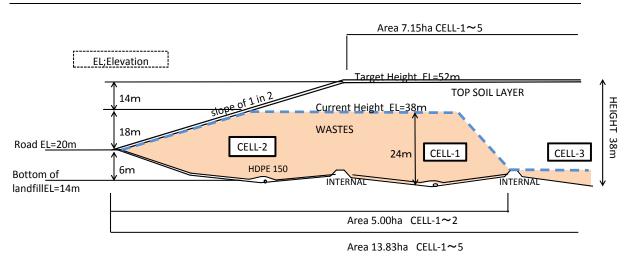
Cross-Section View of Khanh Son Landfill
